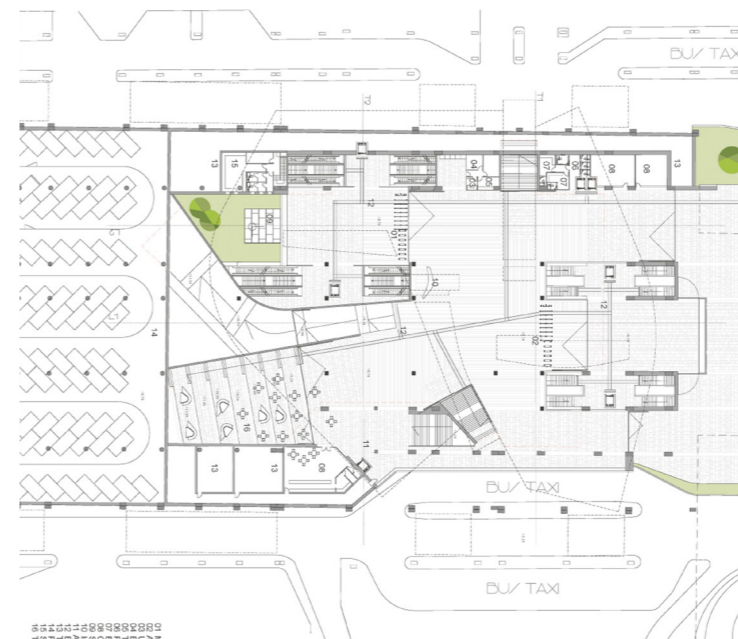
Centro Direzionale Subway station floorplan, Viva (2021)
